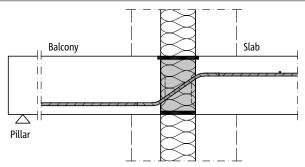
Schöck Isokorb® XT type Q: Connection with non-load-bearing dou-
